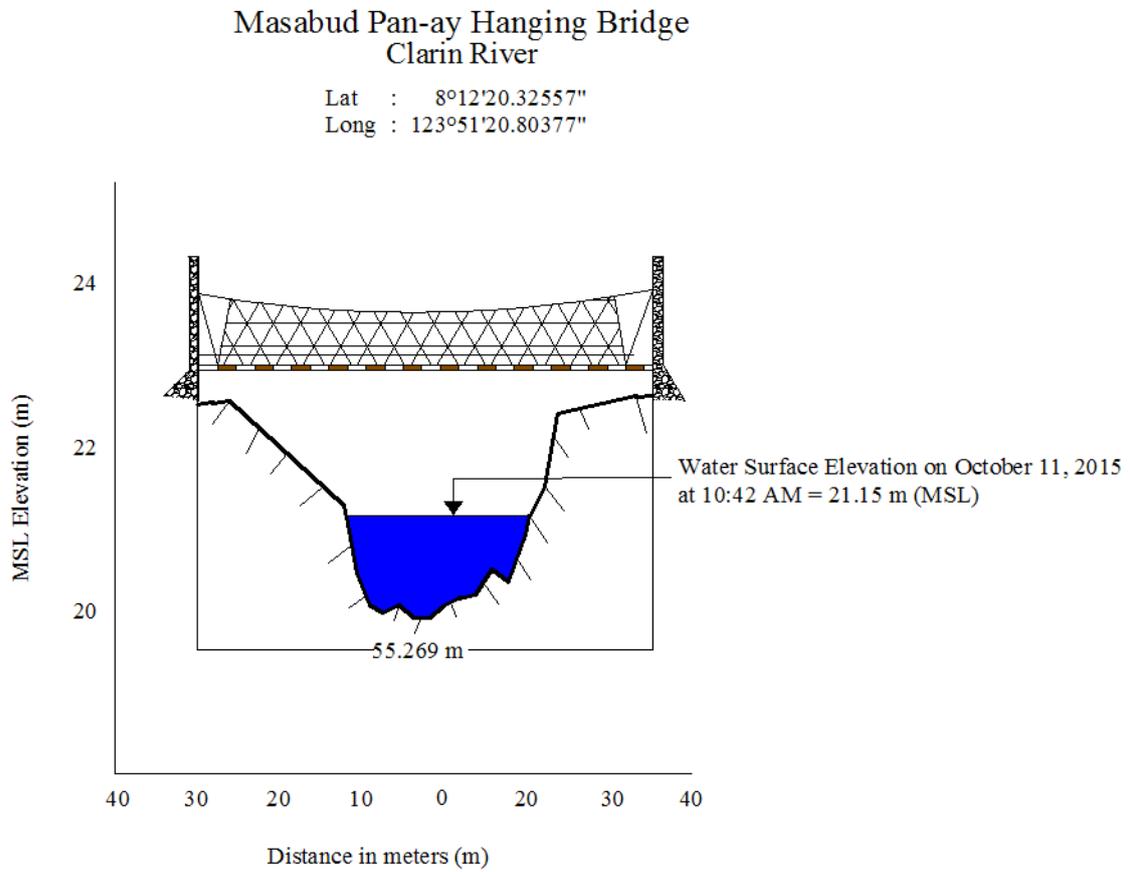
Masabud-Pan-ay Hanging Bridge cross-section survey drawn to scale
